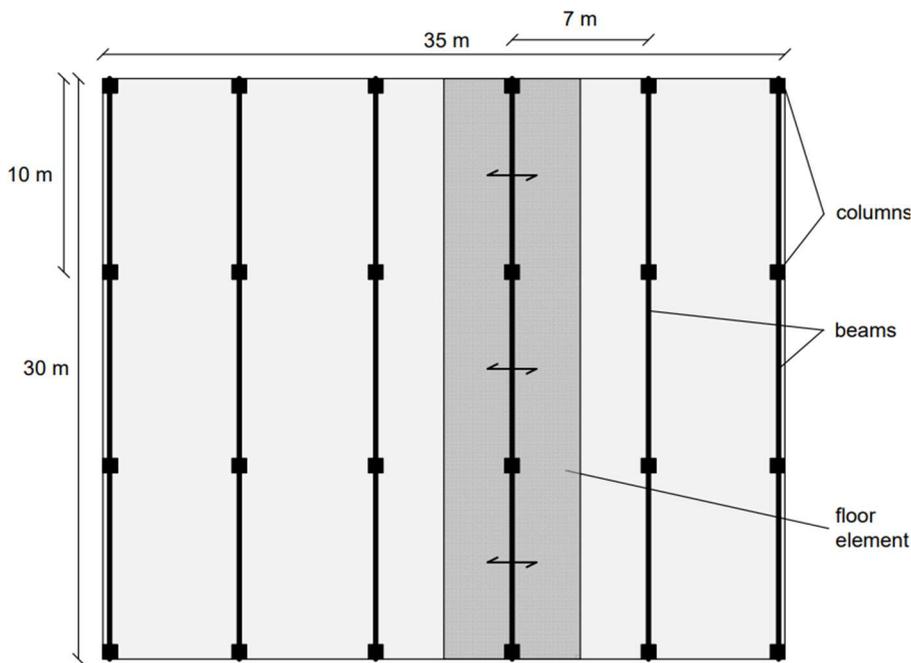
Floorplan ESA/ESTEC for design strategy 2
